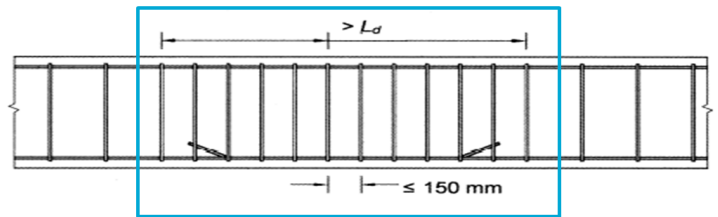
LAP LENGTH AT LOCATION OF SPLICING OF LONGITUDINAL BARS IN BEAM
